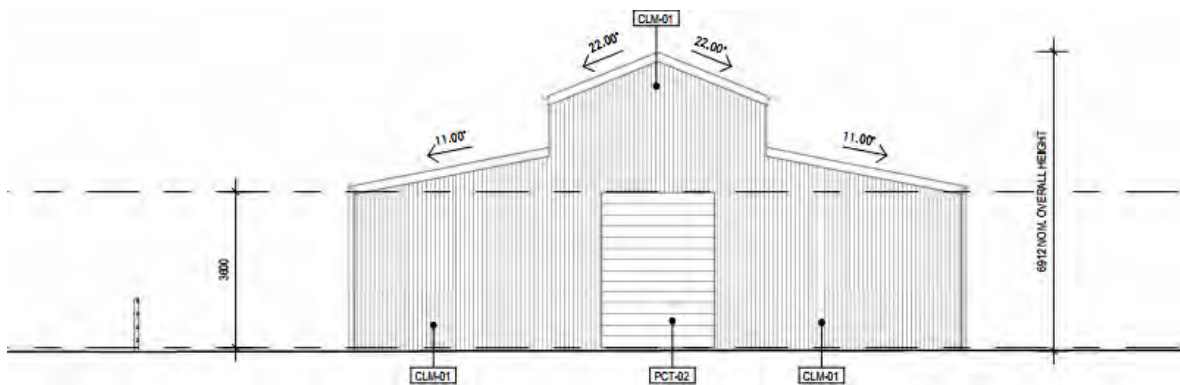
How the proposed dwelling and detached garage will appear to OBrien Road (source: BB Design and Documentation, Proposed Elevations).
